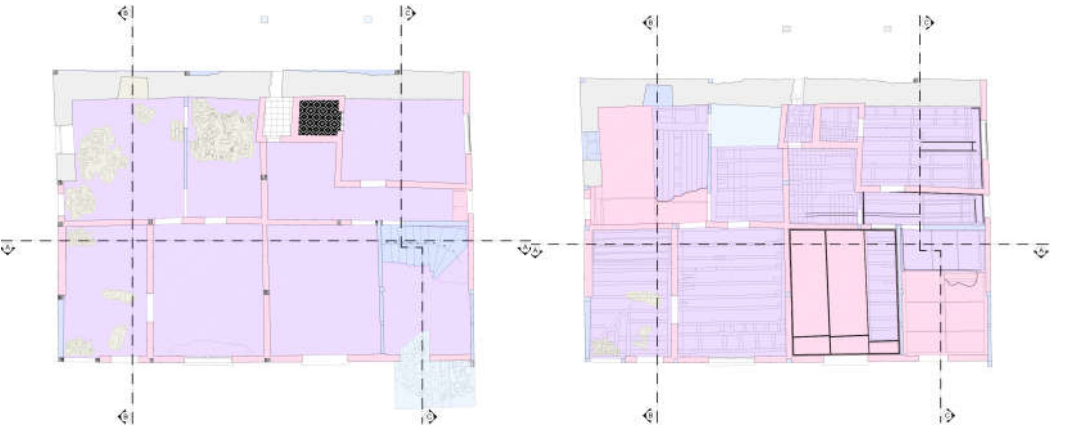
Ground Floor (Left) and Ground Floor Ceiling (Right) Damage Assessment Plan
